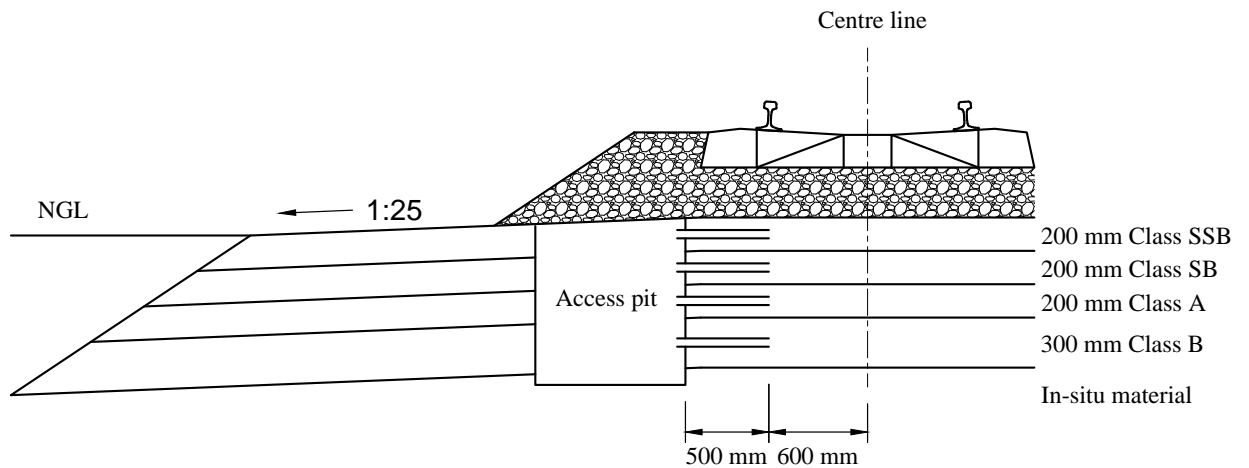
Transverse cross-section detailing the layer works, access pit location and sensor access pipe depths
